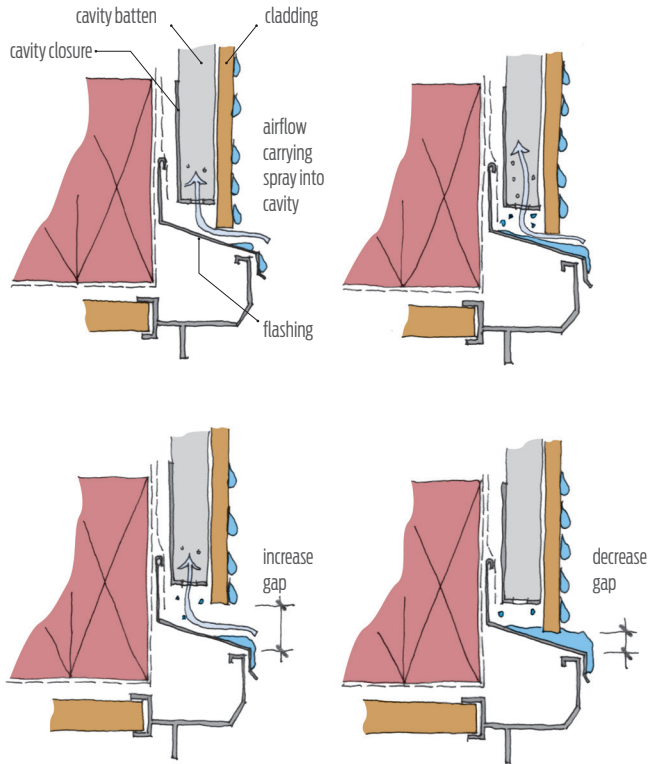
Leakage through a window head junction with varying surface run-off rates and gap dimension between cladding and head flashing.
